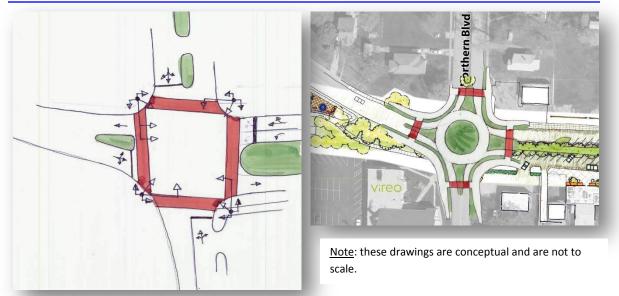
Alternatives for the E. Winner Road and Northern Boulevard intersection
